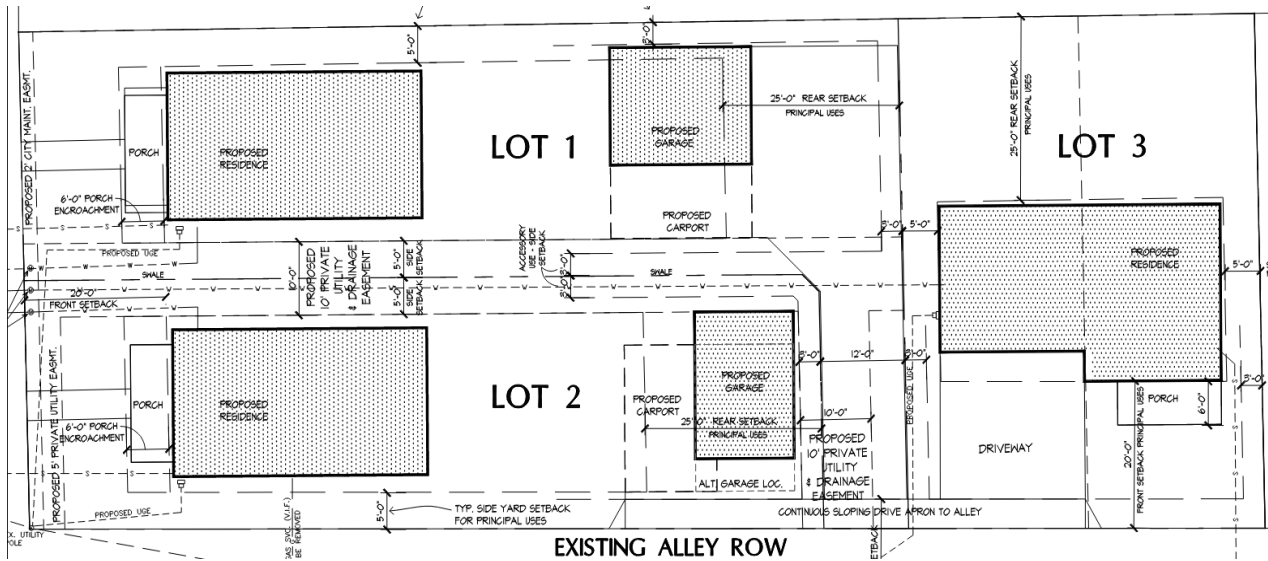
Conceptual site plan of three single-family dwellings, one per lot. The conceptual configuration complies with Old Town Overlay zoning standards. This conceptual site plan is illustrative only and is not part of the requested minor subdivision approval.
